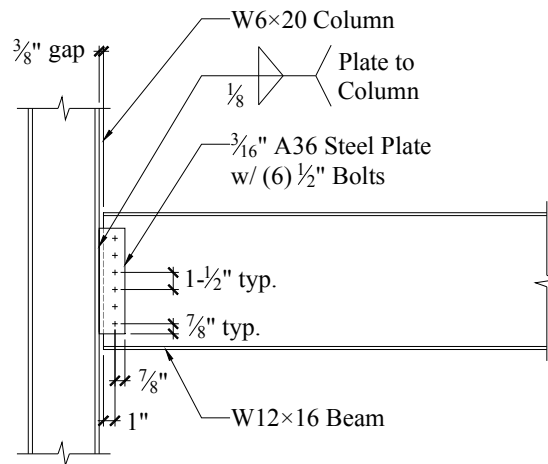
Typical shear-tab connection detail for half-scale gravity frame
